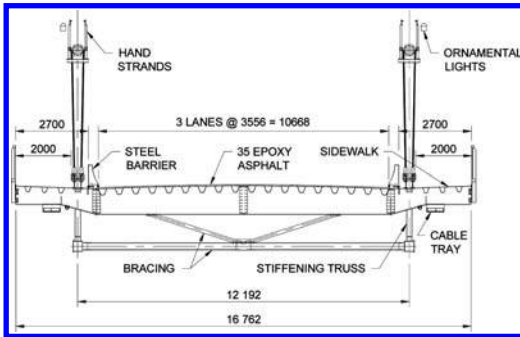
Renovated cross-section, Lions' Gate Bridge.
